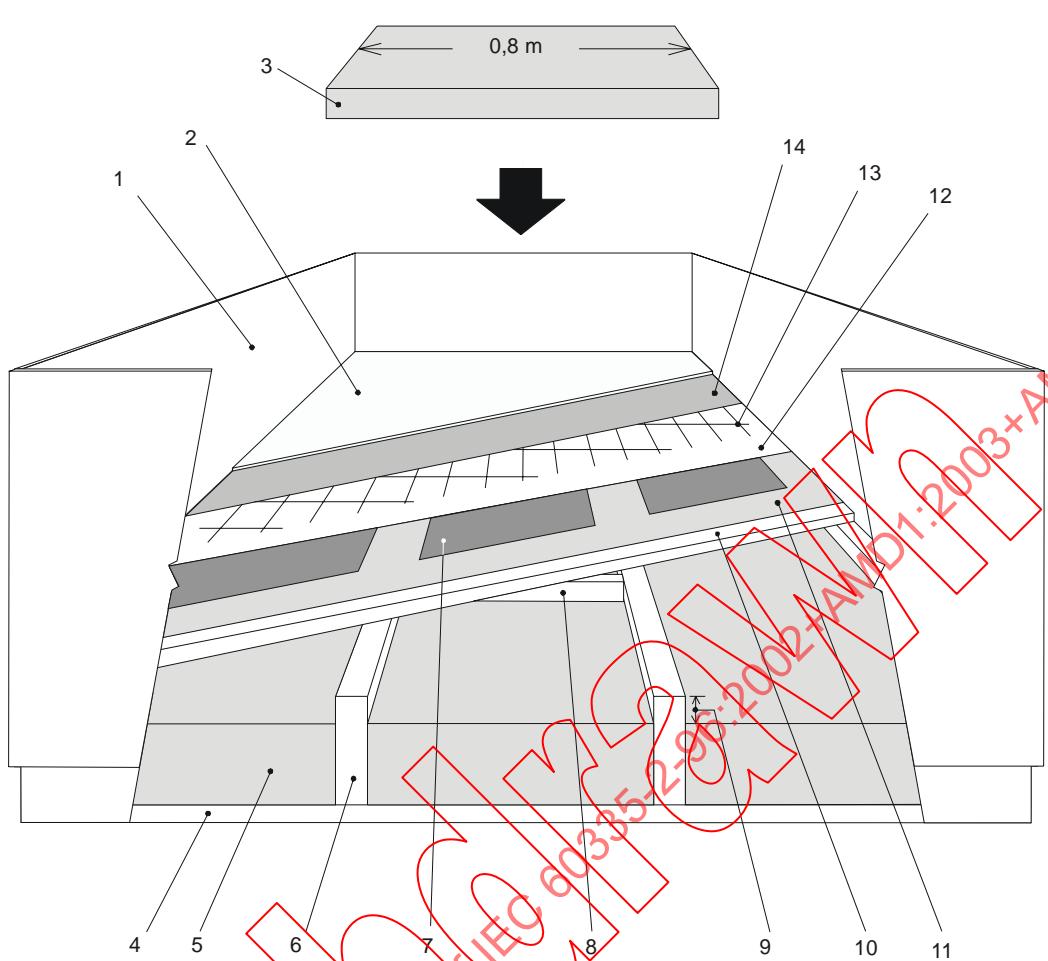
Arrangement for testing heating units in timber floors and ceilings in combination
